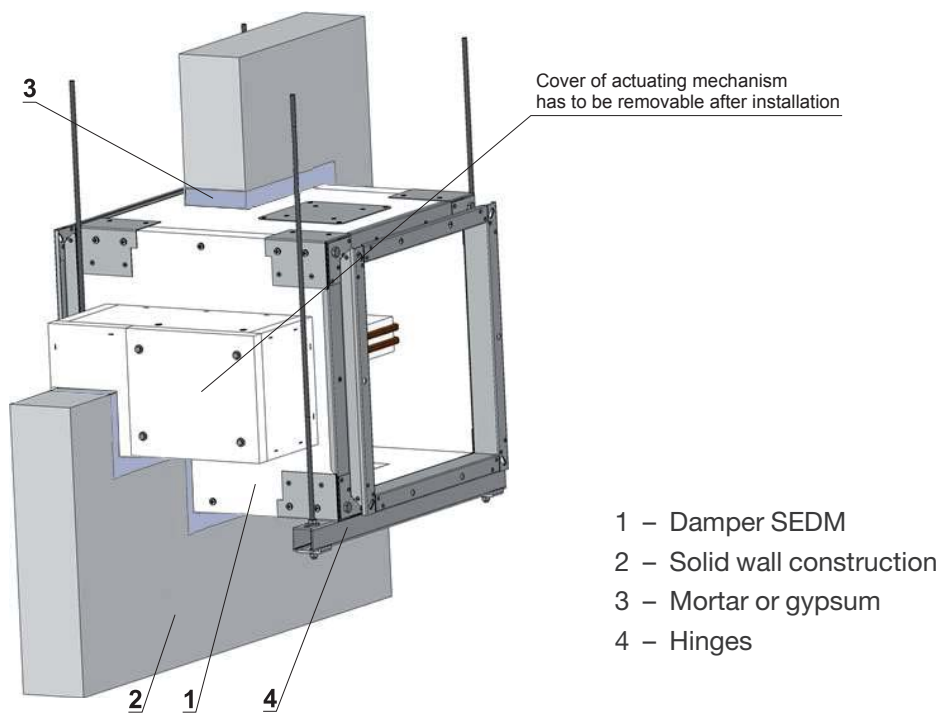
Example of installation in solid wall construction of fire compartment - vertical blade axis position
